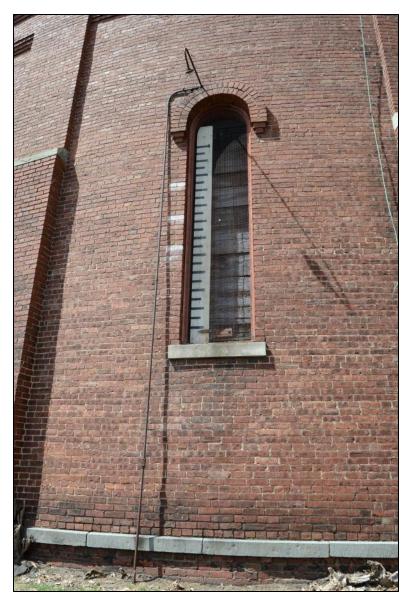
Detail of Gasholder House gauge in window opening, looking west.
